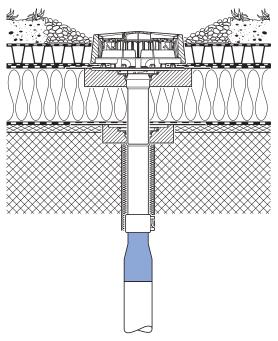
Connecting the Geberit Pluvia roof outlet with an expander
